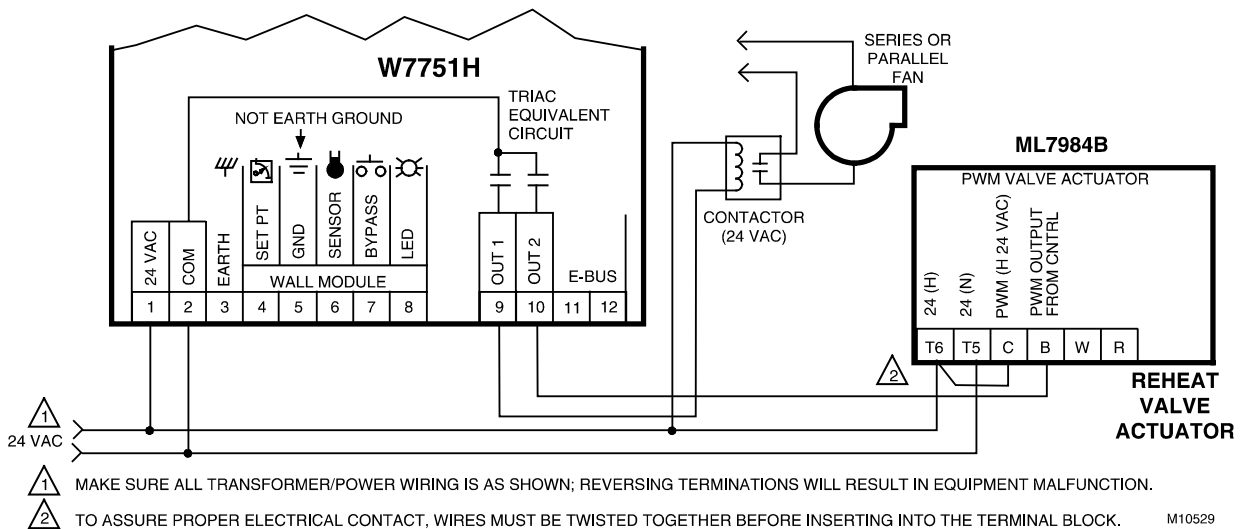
W7751H to PWM Valve Actuator and series or parallel fan.
